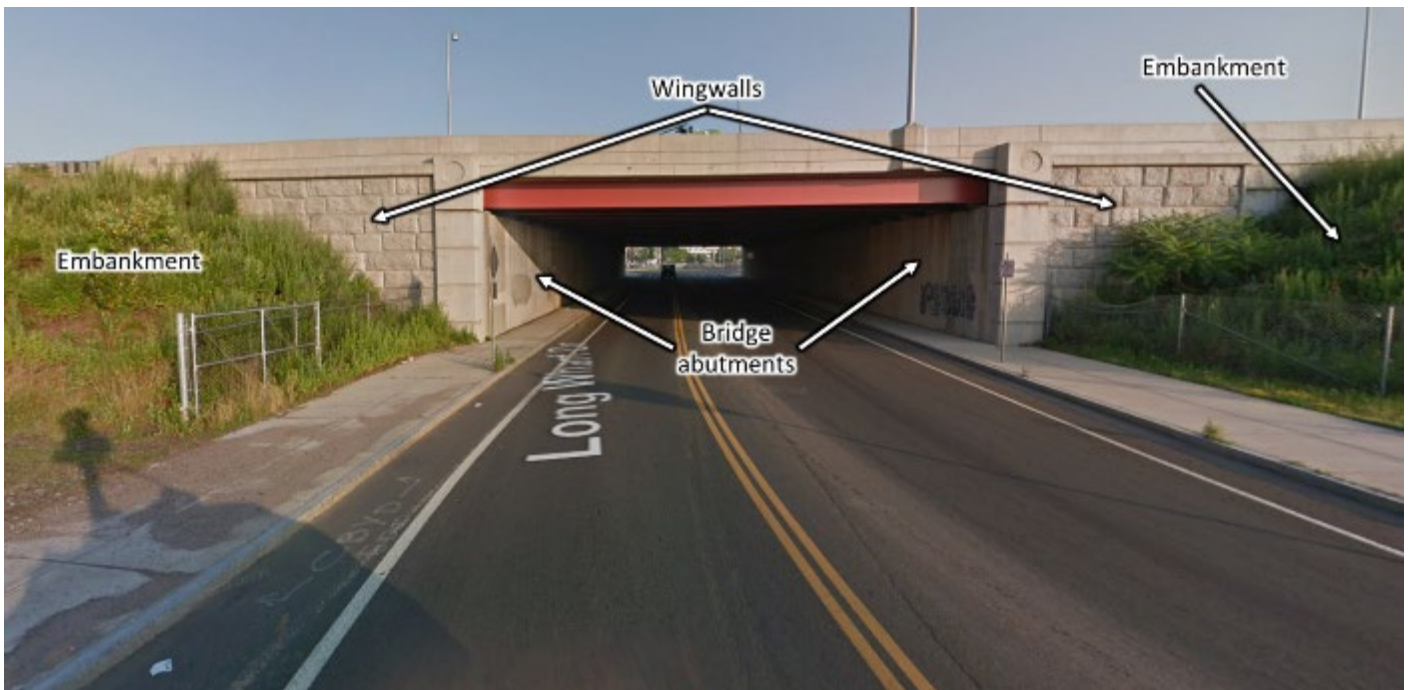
Long Wharf Drive Bridge Under I-95 embankment
